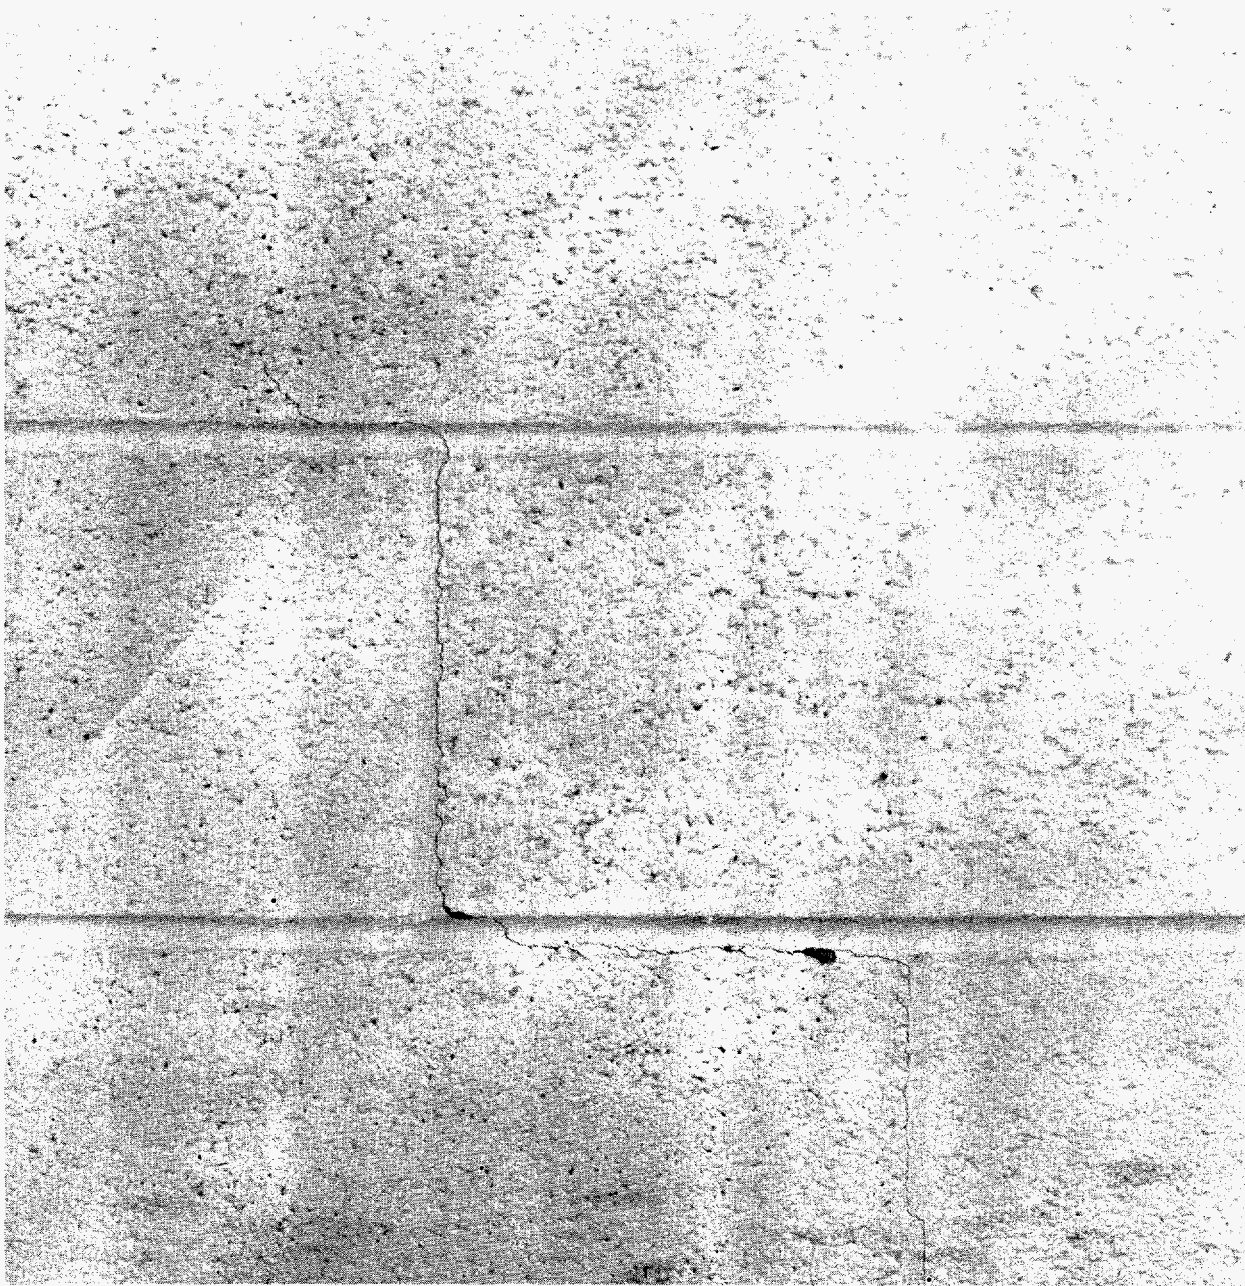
Building 752, north end (fresh flakes were found on ground)
